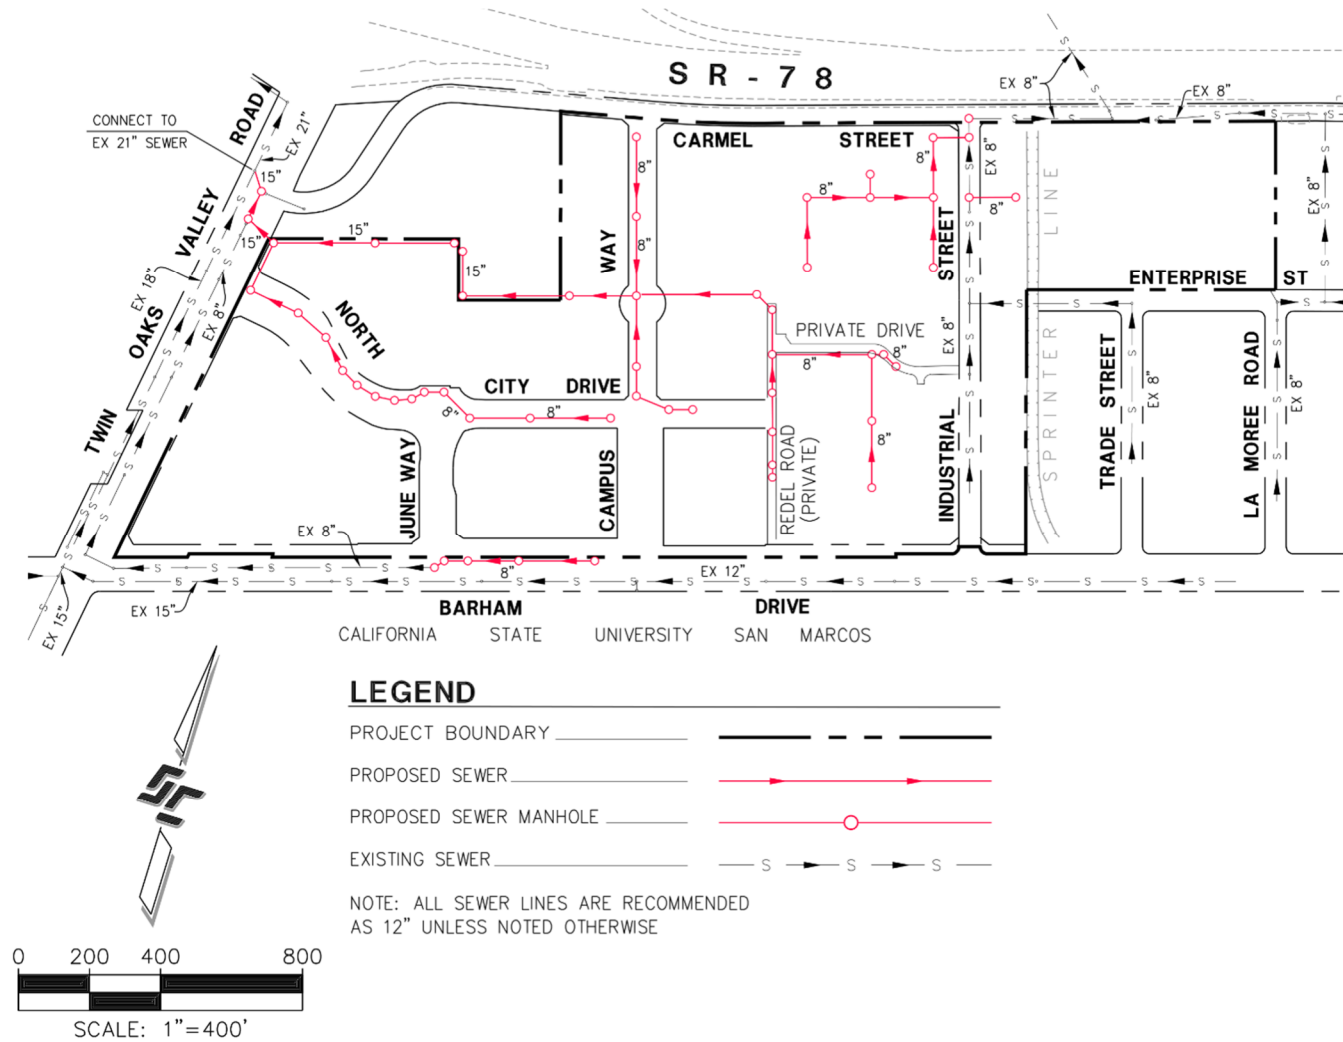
Proposed On-Site Sewer Facilities (East)
